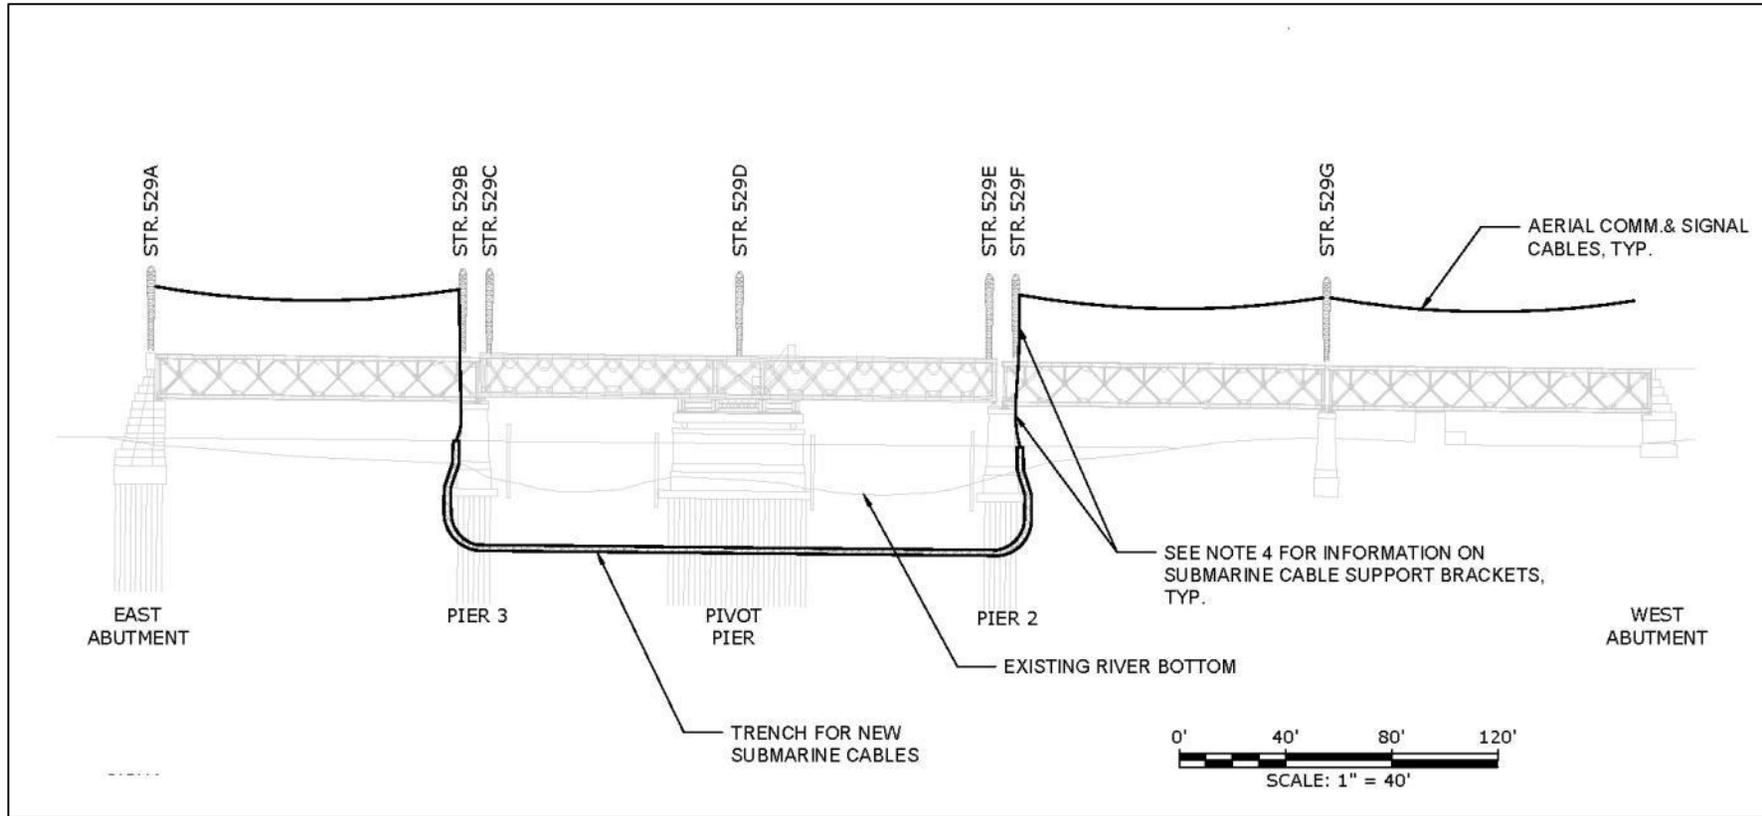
Schematic of cable attachment, Saugatuck River Railroad Bridge.
